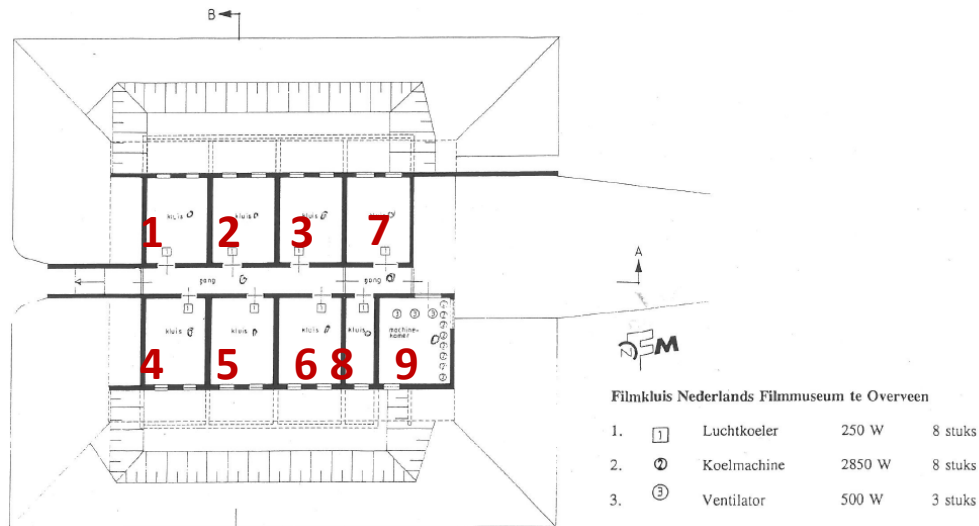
Plan of the archive in Overveen. 1-8: archive storage; 9: technical room.
